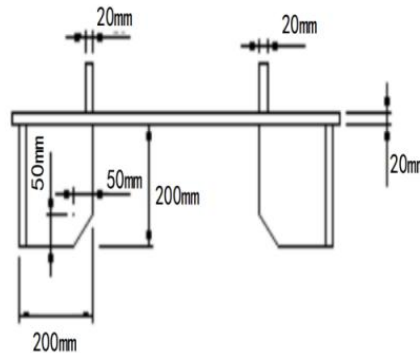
Top View Design Diagram of the Steel Hanging Plate
